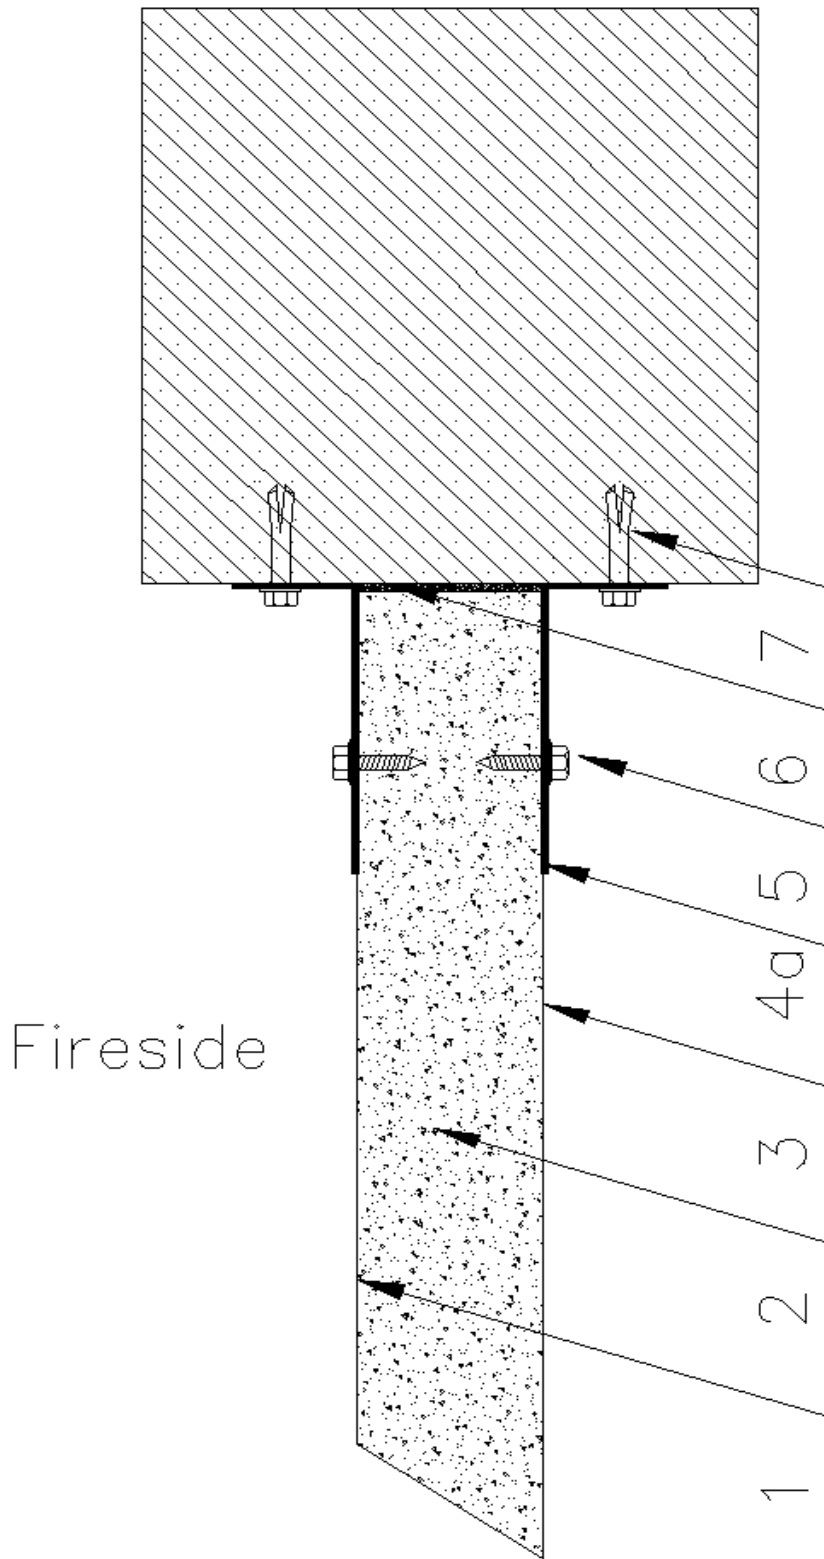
Section panel fixing A at the top and the vertical side at the aerated concrete pier
